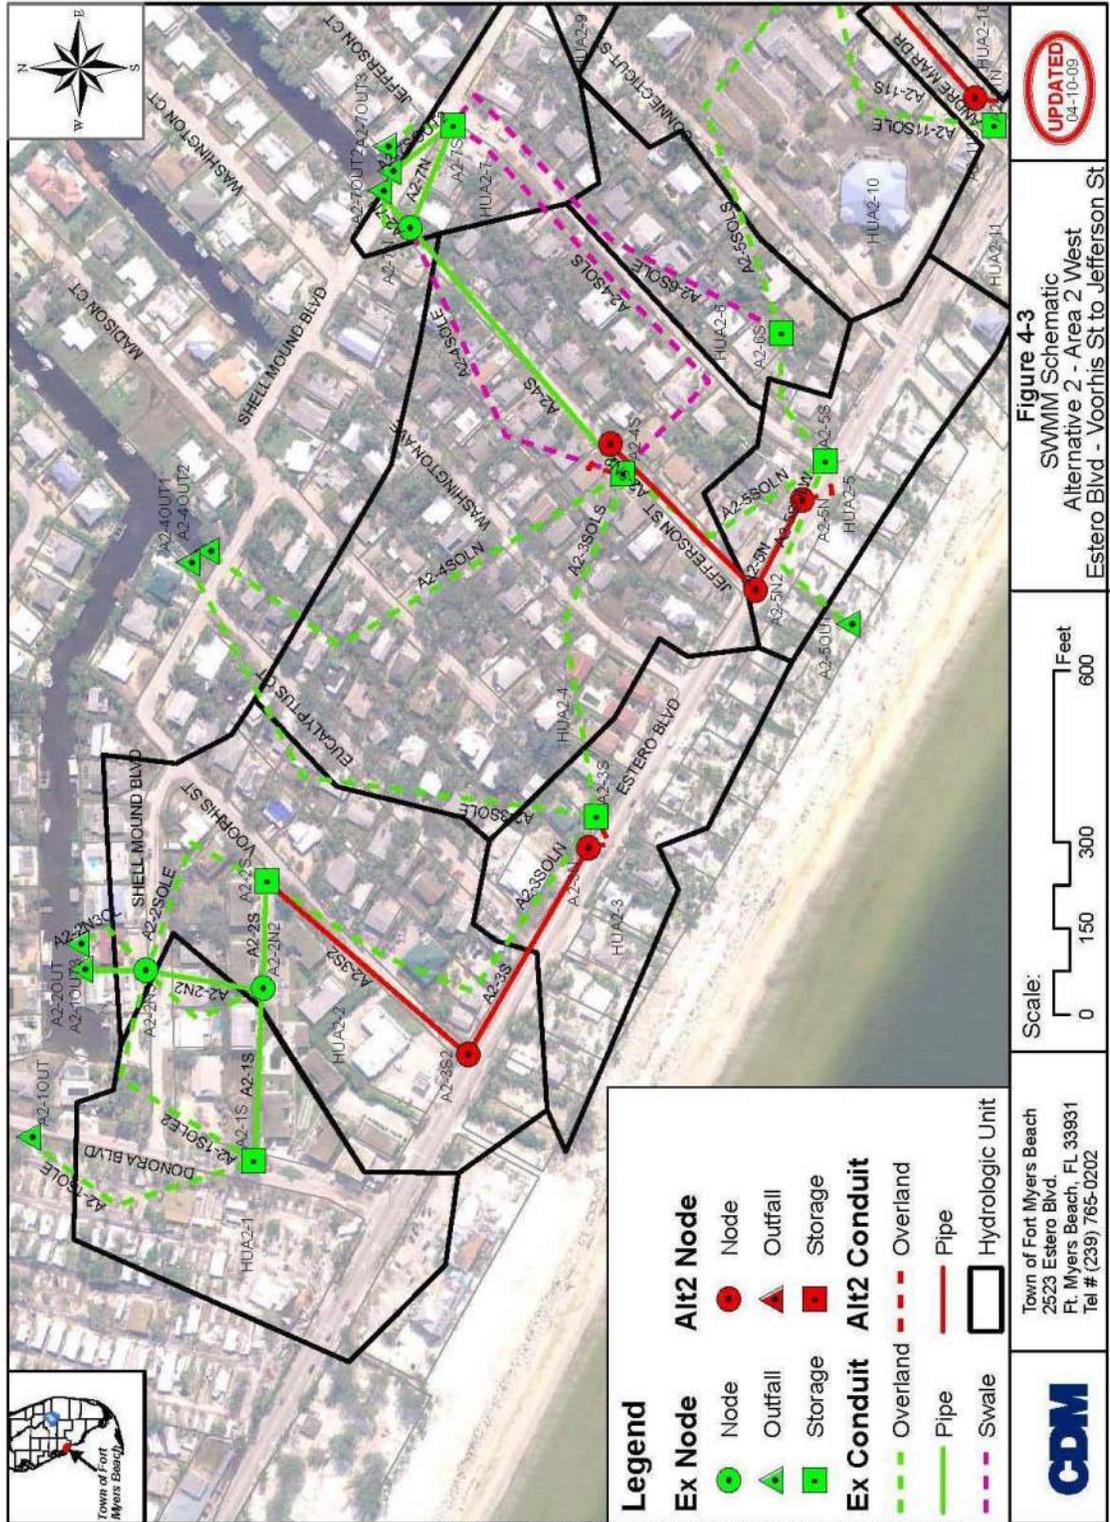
shows the west section of problem area 2. New pipes (A2-3S) are proposed in Estero Boulevard that would convey runoff from Washington Street, Madison Court and Eucalyptus Court to new piping in Voorhis Street (A2-3S2). Additionally, new piping in Estero Boulevard is proposed to convey runoff from Connecticut Street and Mid Island Drive to existing piping in Jefferson Street (A2-5N2). Figure 4-4 shows the east section of problem area 2. New pipes (A2-11N and A2-10S) and swales (A2-11S) are proposed in Andre Mar Drive that would convey runoff from Estero Boulevard to the existing outfall at the end of Andre Mar Drive (node A2-9S). New piping is proposed in St. Peters Drive (A2-13N2) that would route flooding from Estero Boulevard to new piping in Anchorage Street (A2-10N and A2-10N2). A field survey would be required to verify the feasibility of the section in Anchorage Street. A second option could be to install new piping between the houses on St. Peters Drive and Anchorage Street, the current location of a swale (A2-13N). The town has expressed an interest in the possibility of utilizing the location of this swale for stormwater improvements since an easement is already secured.
